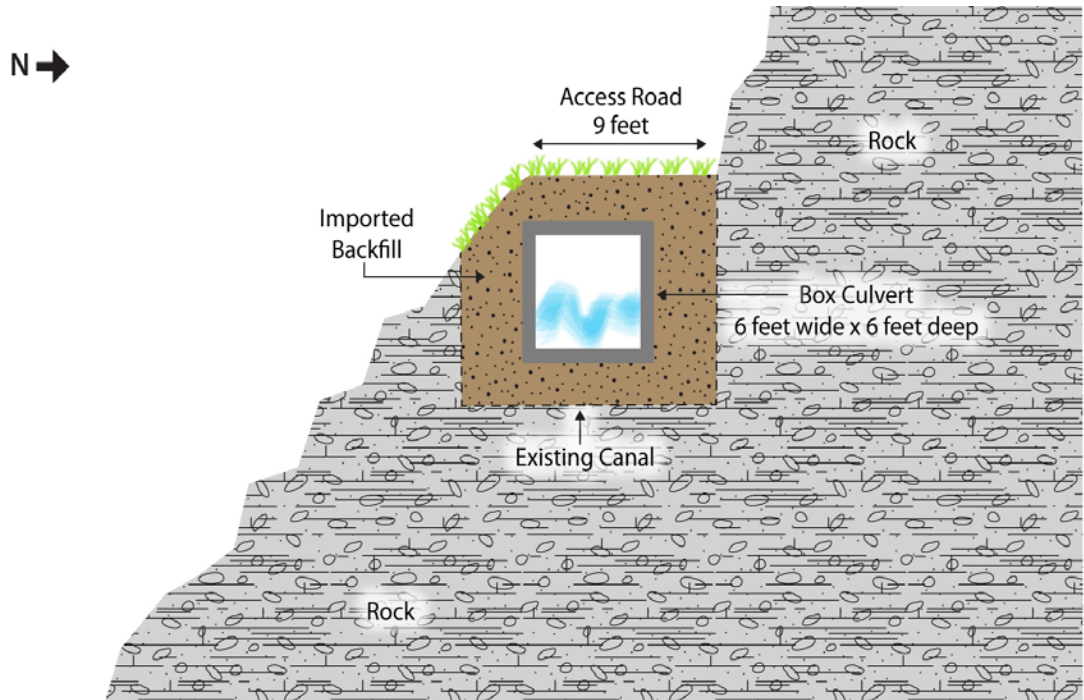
Typical Cross-Section A: 6-foot-wide by 6-foot-deep box culvert in Logan Canyon (looking downstream)
